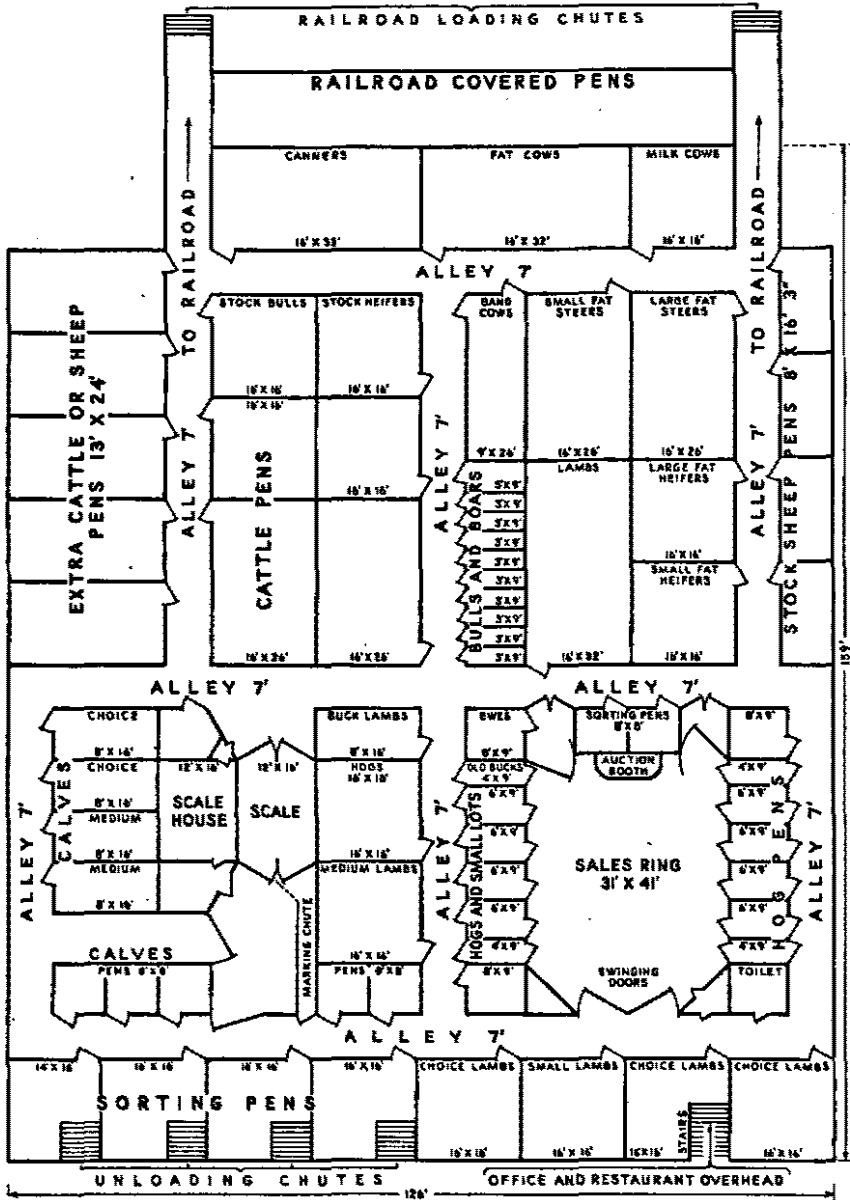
FLOOR PLAN OF A WELL-ARRANGED AUCTION IN THE EAST CENTRAL SECTION.
